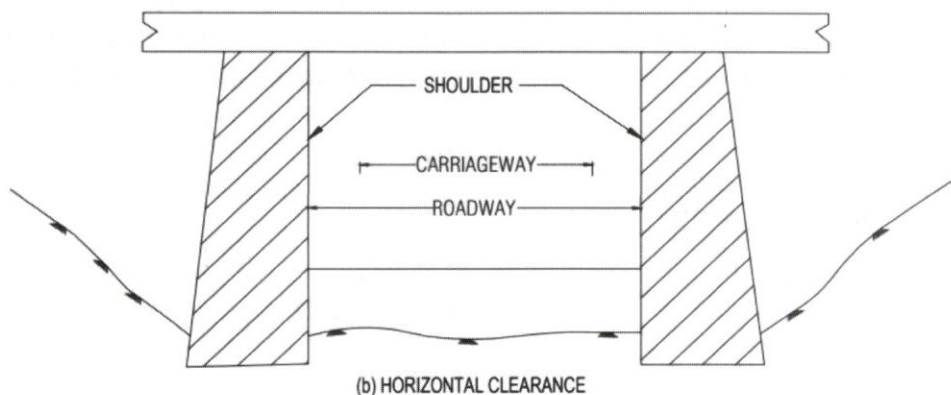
Typical Details of Vertical/Horizontal Clearance
